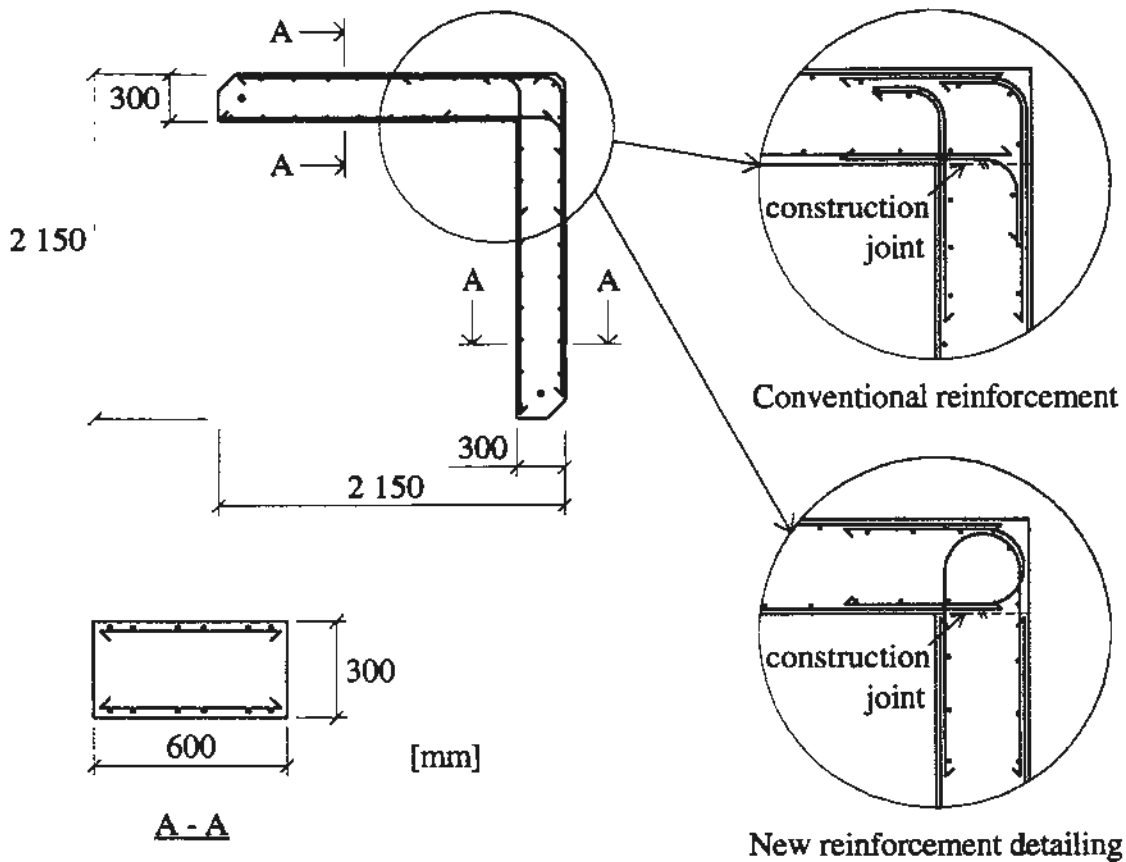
Dimensions and detailing for specimens with reinforcement suitable for shelter design.
